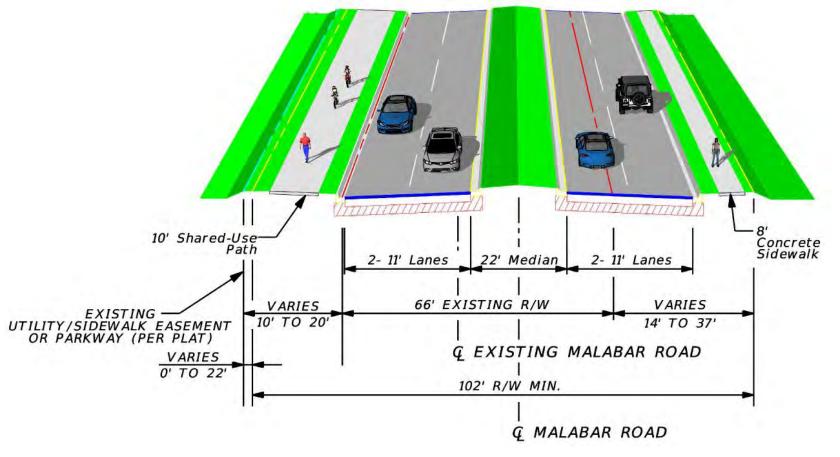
Recommended Preferred Alternative – St. Johns Parkway to Canal 10
